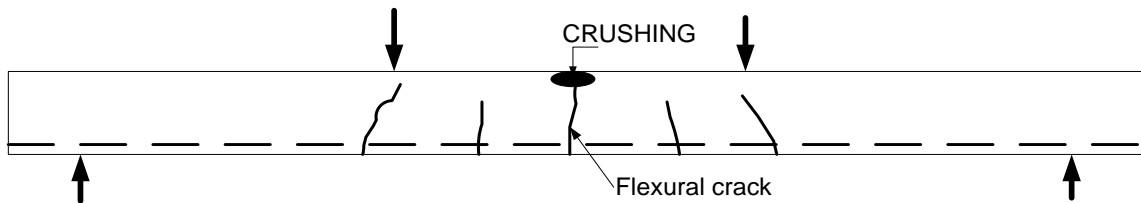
Typical Flexural Failures with Multi Cracking and Crushing of RC Beam
